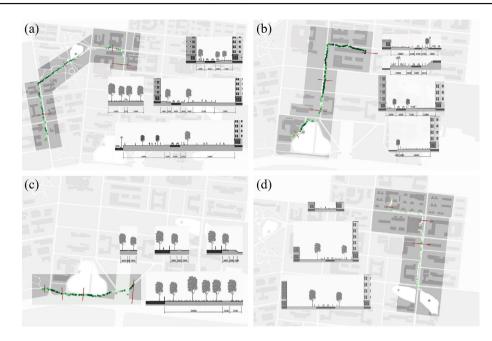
The layout, distribution of greenery visibility and road cross-section of four routes. (a) From West Building 12 to the Library; (b) from South Building 4 to the History Museum; (c) from South Building 4 to South Gate 1; (d) from Zuiwan Pavilion to Wutong Yu.
